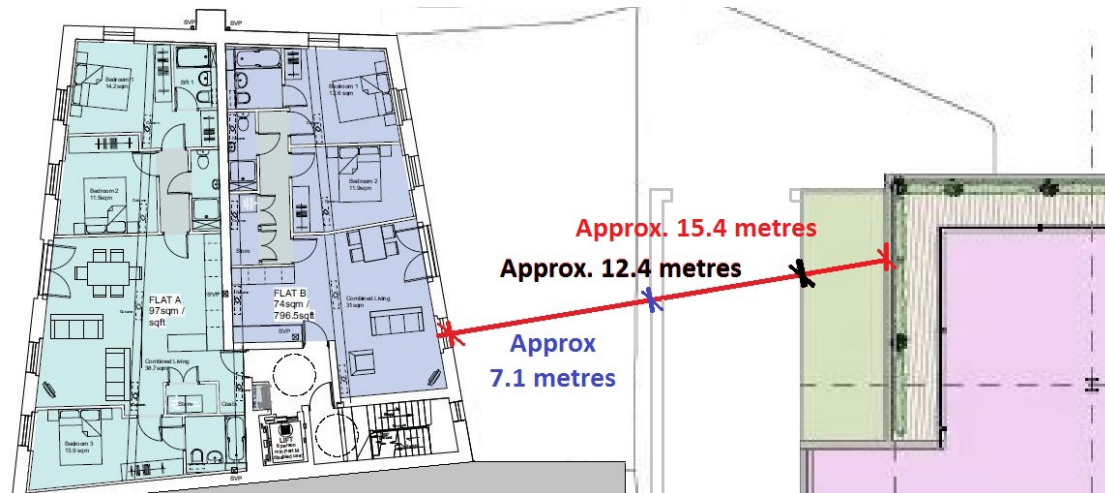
(above): Plan showing the proposal's relationship to the first floor configuration of 55 Great Suffolk Street, as consented under ref. nos. 17/AP/4668 and 17/AP/4715.
